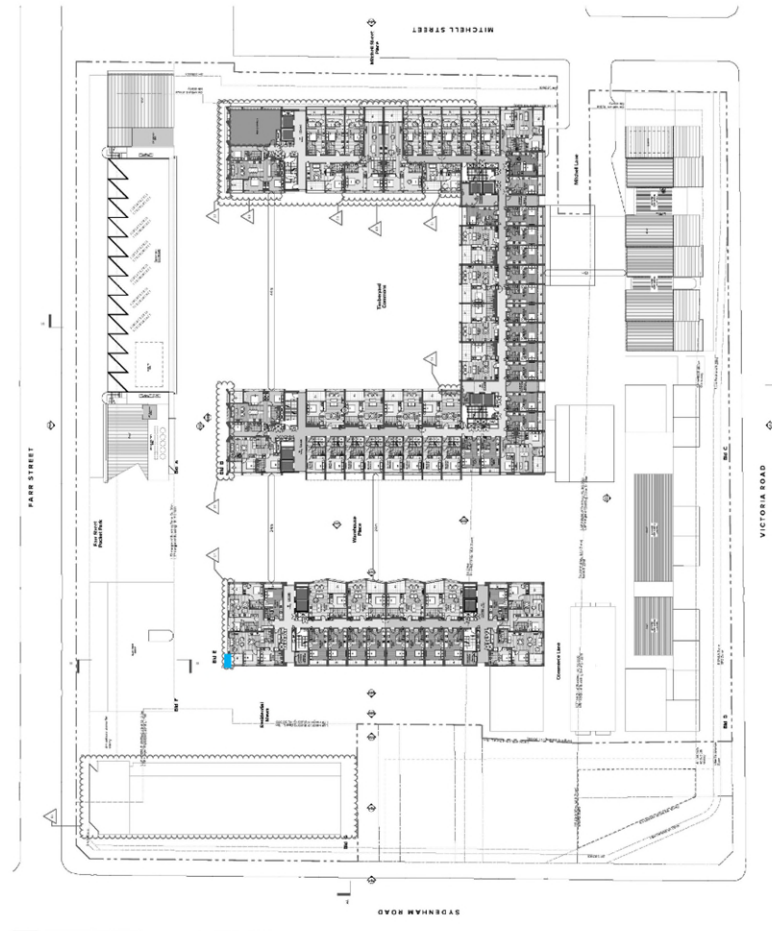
Suggested Treatments – Level 05 to 09 Plan (typical plan shown)
